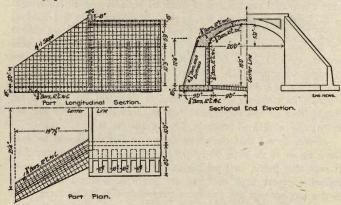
Reinforced Concrete Arch Culvert of 20-Ft. Span.
